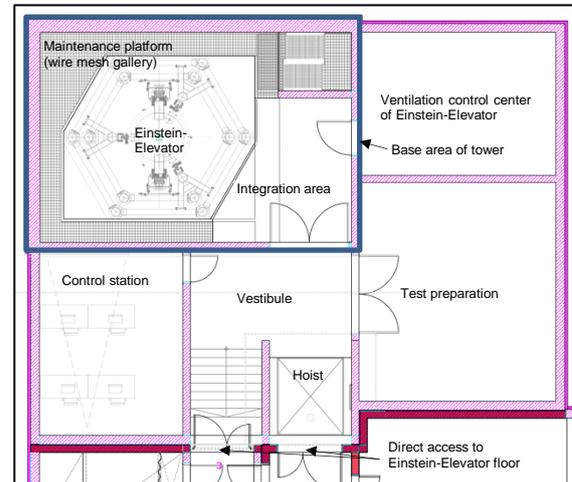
1st basement floor plan and top view on installation surface and wire mesh gallery around the Einstein-Elevator
